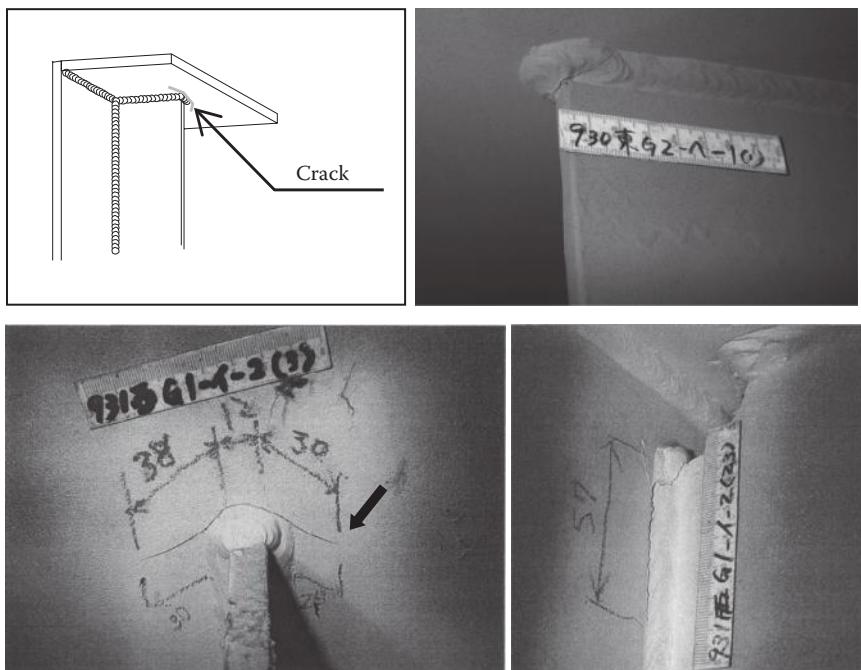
Fatigue cracks around the top end of vertical stiffener (BA-type fatigue crack).
